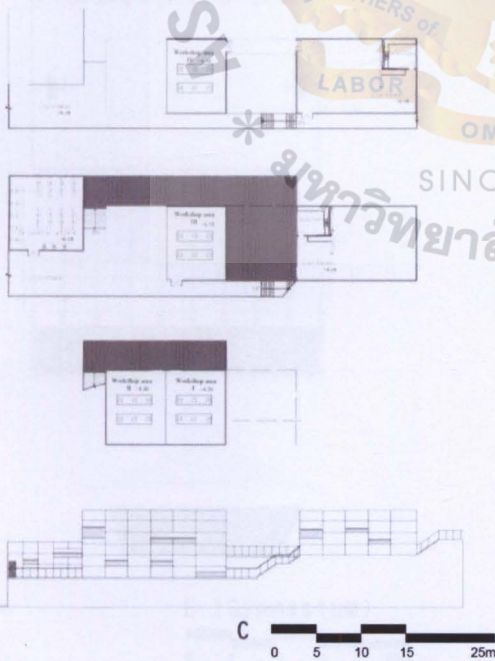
Schematic 2: all floor plans and elevation of Supports building
